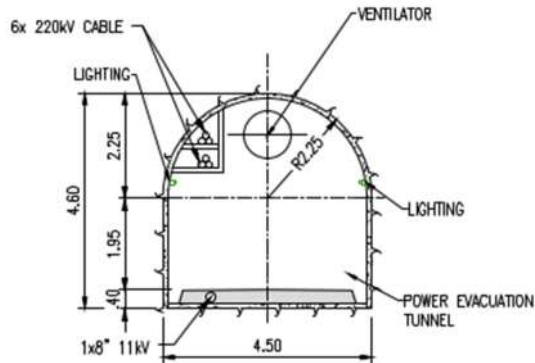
Emergency and Power Evacuation Tunnel – typical section
